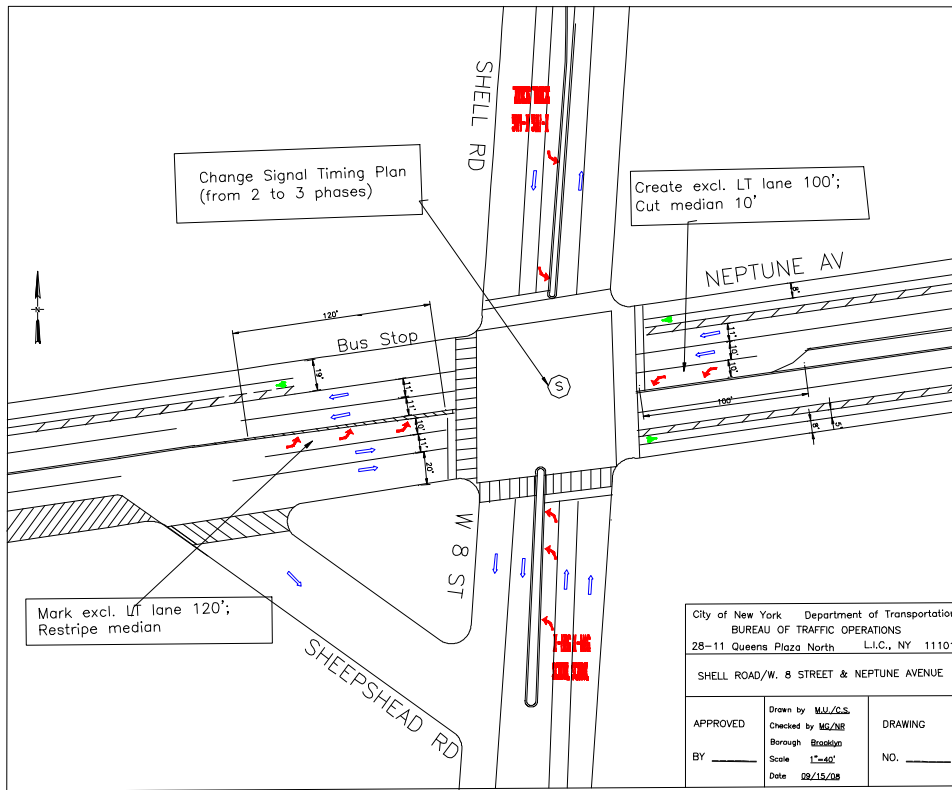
Neptune Avenue & Shell Road/West 8th Street - Proposed Conditions
